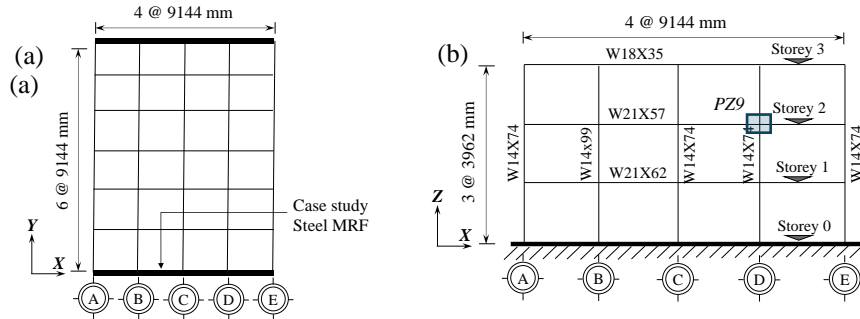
Case study steel moment resisting frame (MRF): (a) Plan view; (b) Elevation view.
